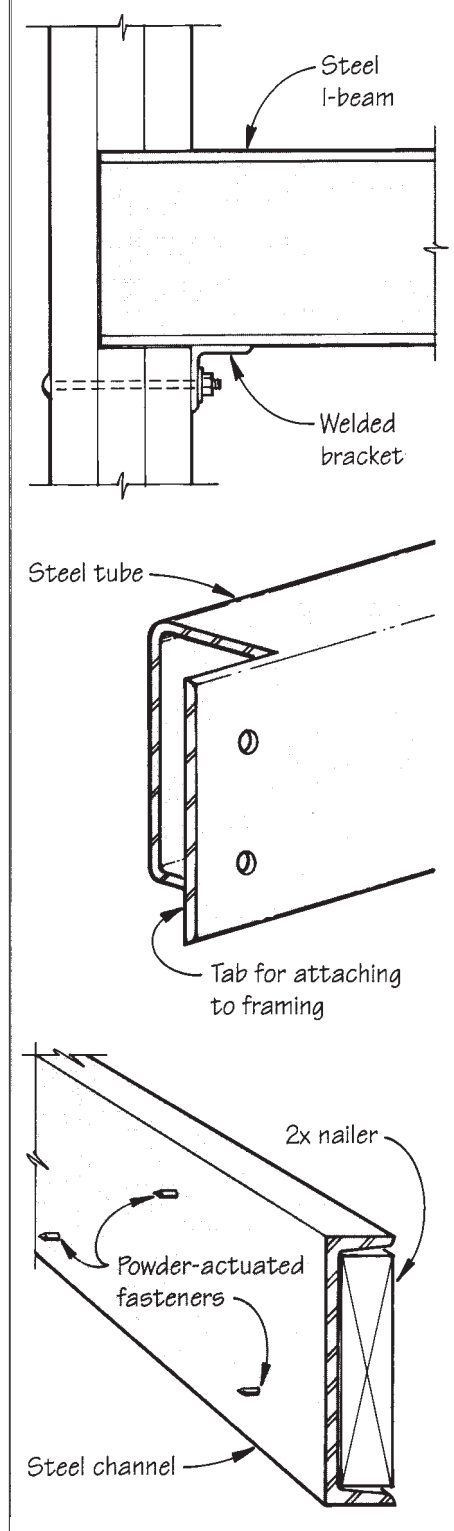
A common way to attach a steel header to wood framing is to have the steel yard weld on an attachment angle bracket (top). The steel cutter can also leave an attachment tab on the ends of a piece of steel, as with the tube shown here (middle). On site, the quickest method is to fasten a 2x nailer to the steel using powder-actuated nails (bottom).
